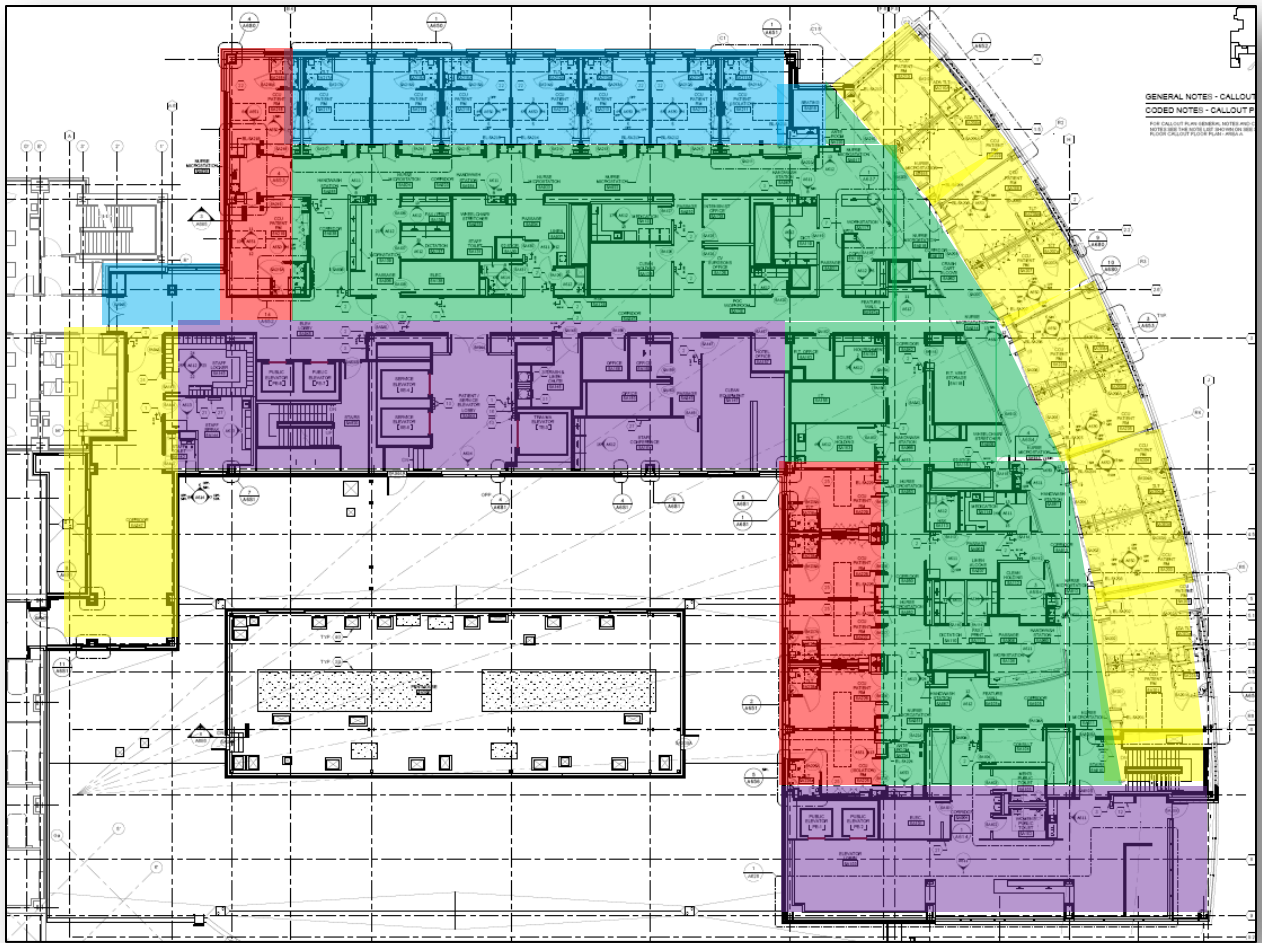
Typical Fifth, Sixth, & Seventh Floor Block Zones
